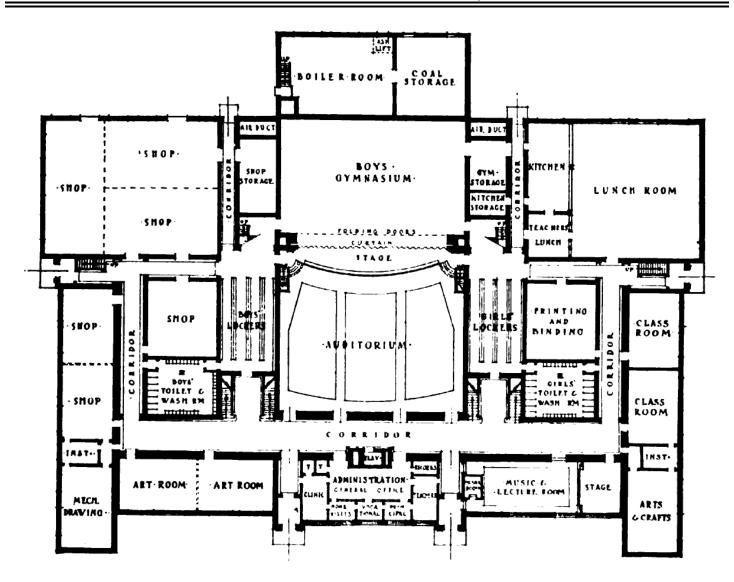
"Typical" Ground floor Plan, Small Intermediate School, Buffalo, N.Y. Associated Buffalo Architects; William B. Itner, Consulting Architect. <sup>26</sup>
